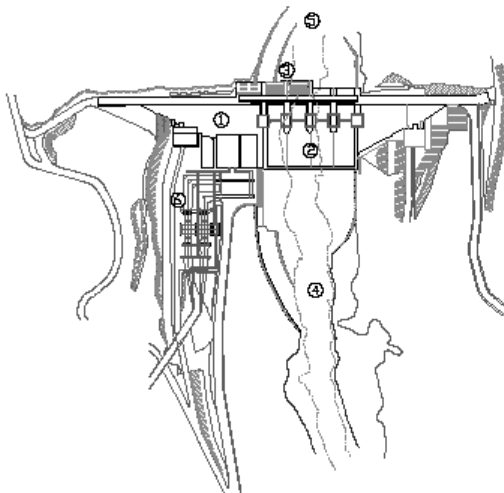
Layout of Ulza HPP. ①: concrete gravity dam, ②: spillway, ③: power waterway intake, ④: Mat River, ⑤: reservoir, ⑥: switchyard.
